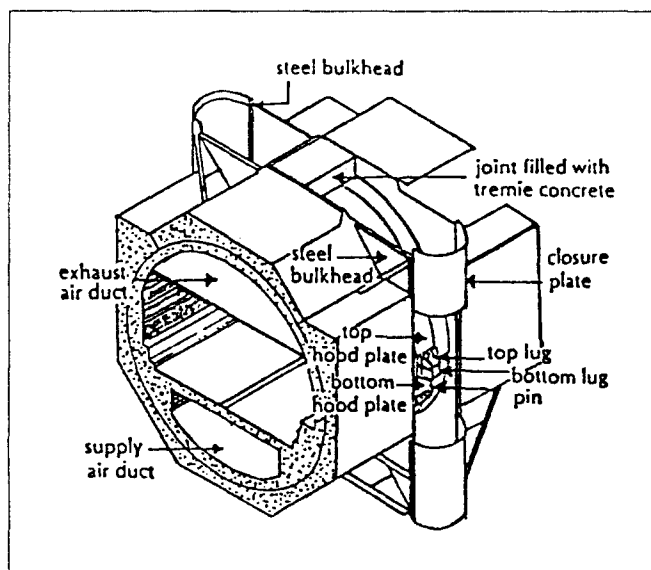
Typical tremie concrete joint for a double-shell steel tunnel.
